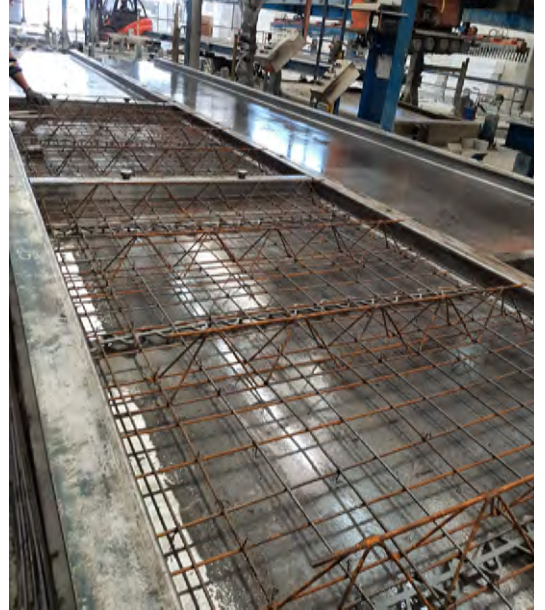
Placing of the spacers and arrangement of the reinforcement.
